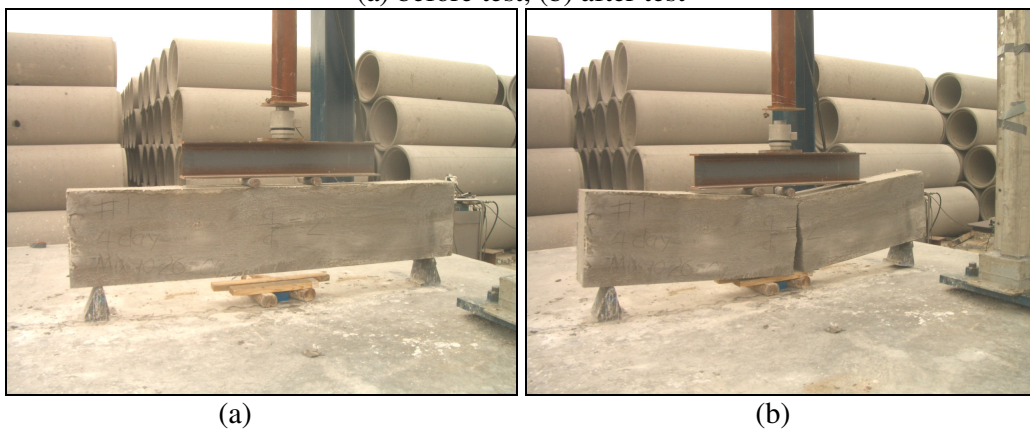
Beam for 1<sup>st</sup> batch concrete cast on 10/26/06 for 3 day test;
